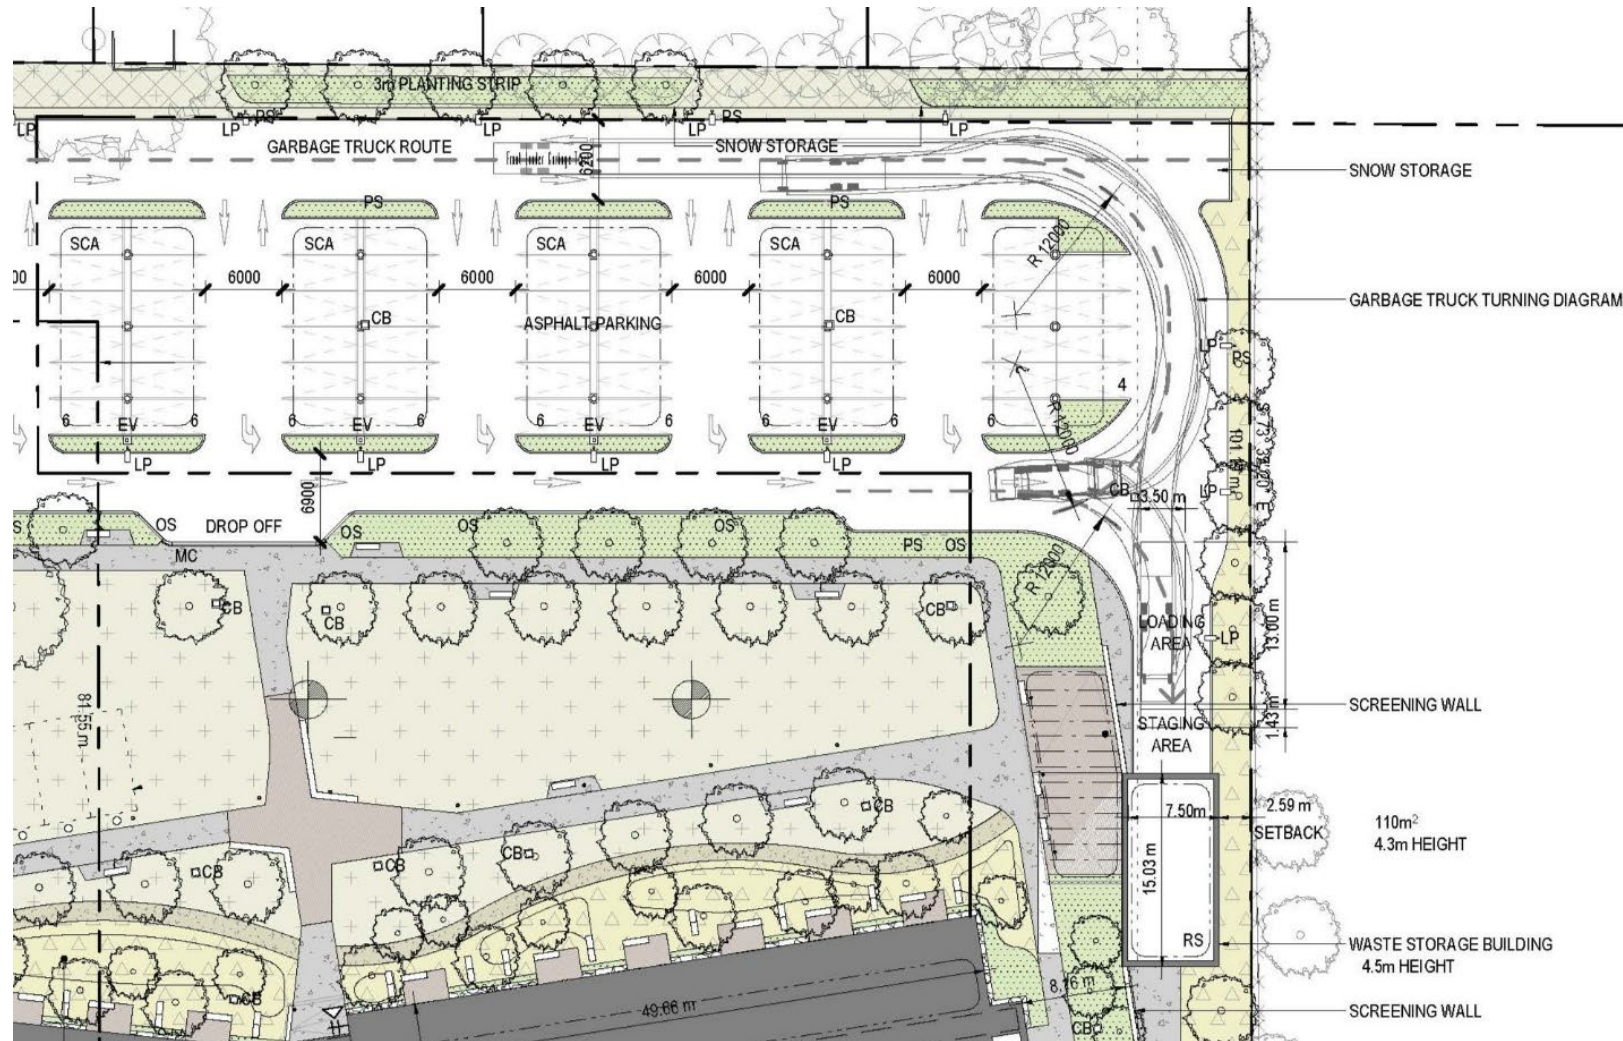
Site plan illustrating an acceptable Loading and Staging Area.
